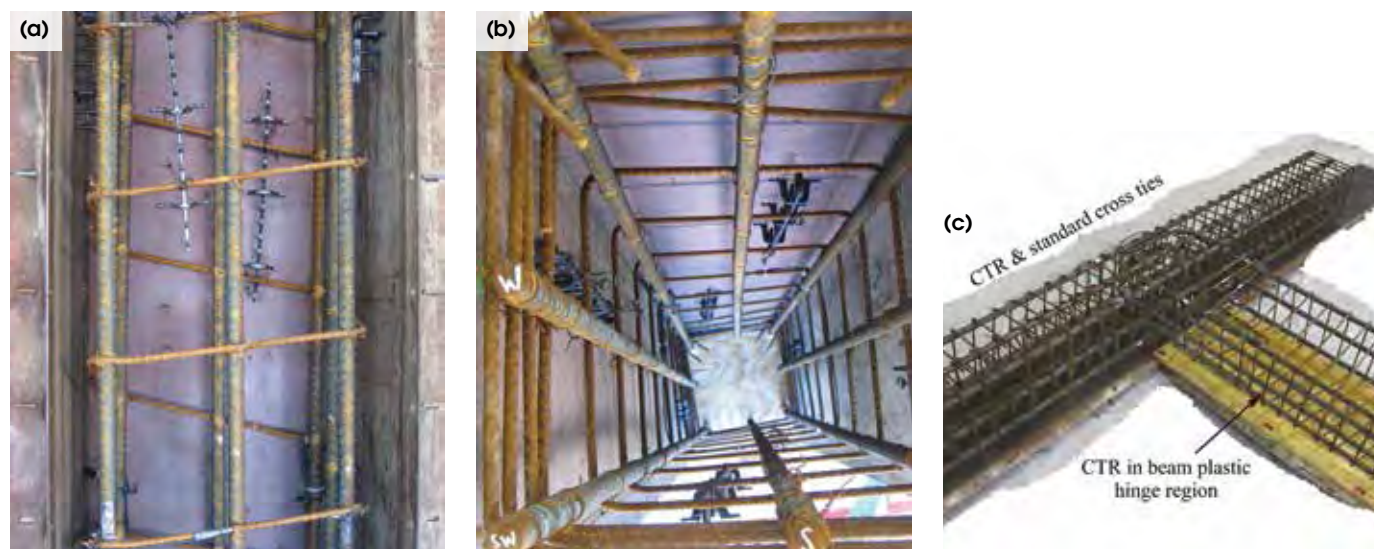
Examples of reinforcing cages fabricated with CTR: (a) column elevation; (b) column cross section; and (c) exterior beam-column connection
